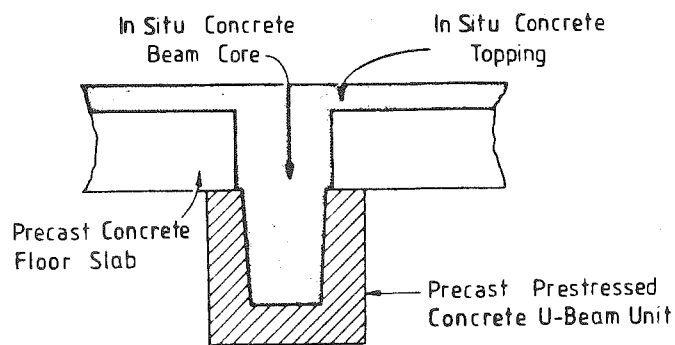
Section of Composite Beam in Finished Structure (Reinforcement not shown).
